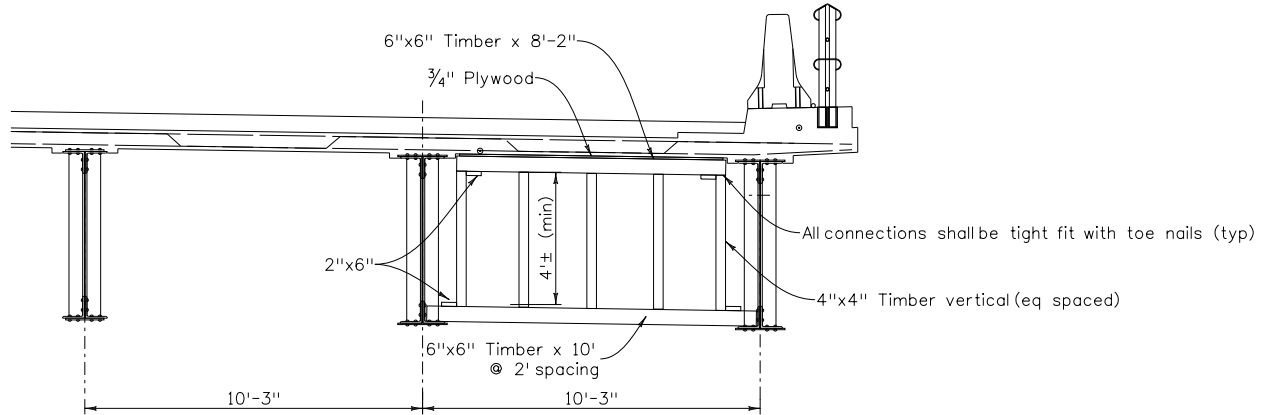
(I)-1 Sample Section of Falsework to support a deck
